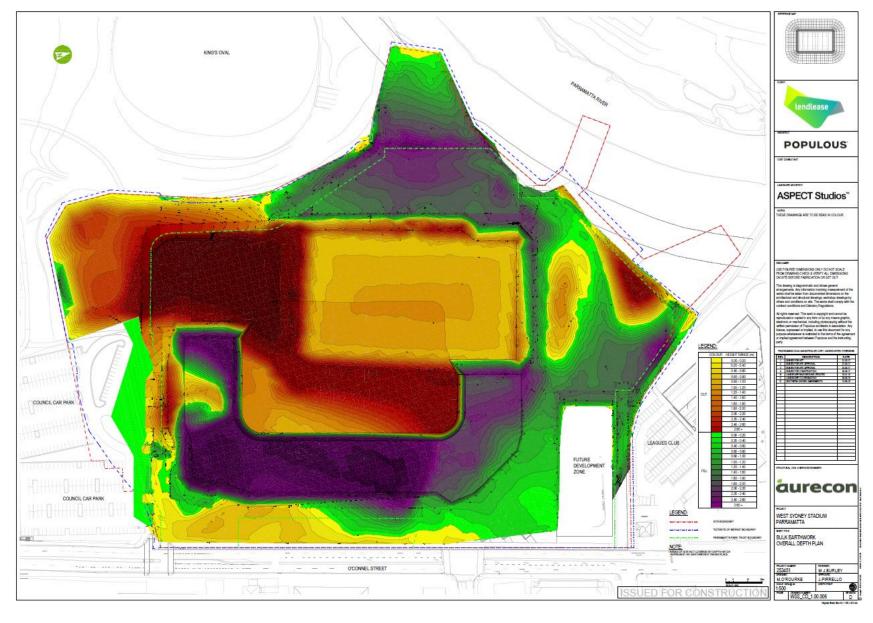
Updated plan of cut and fill showing the redesign to the south to reduce impacts.
